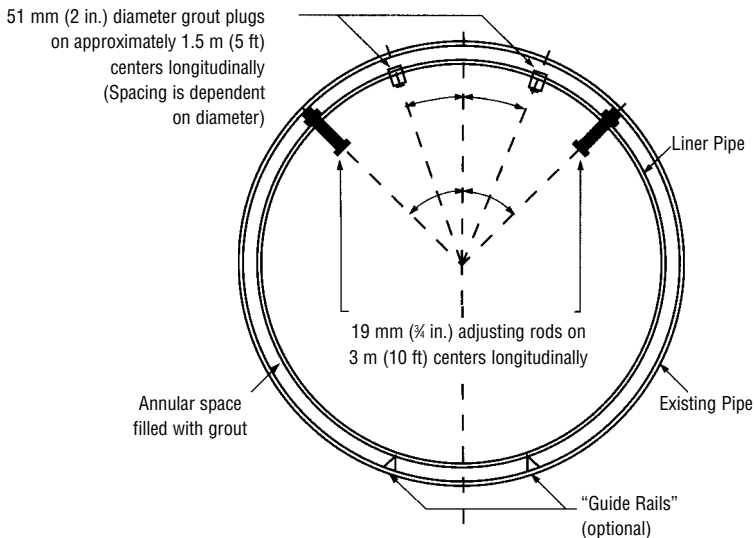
Typical section of corrugated steel pipe fabricated for sliplining.
